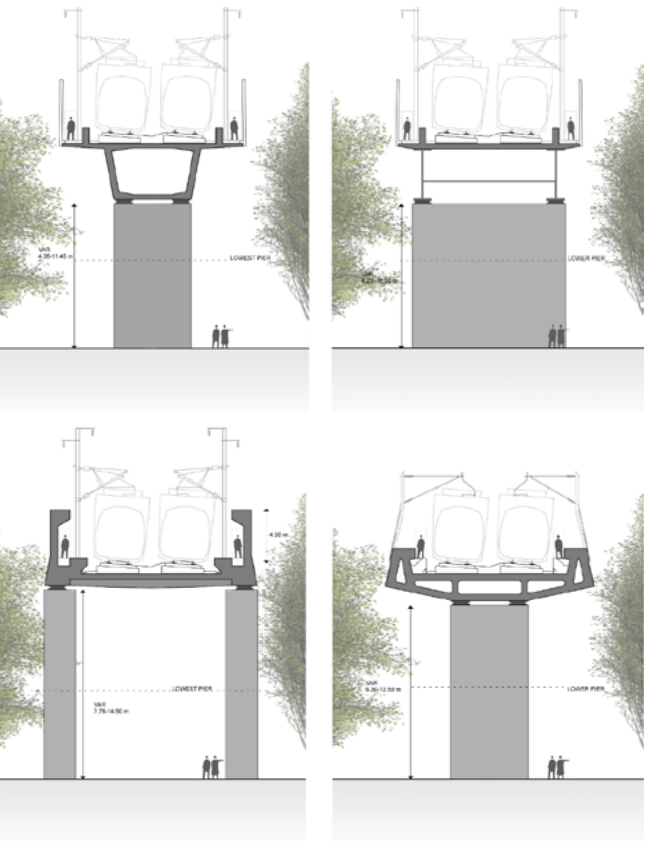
(a to d): Alternative deck cross-section and substructure forms considered
